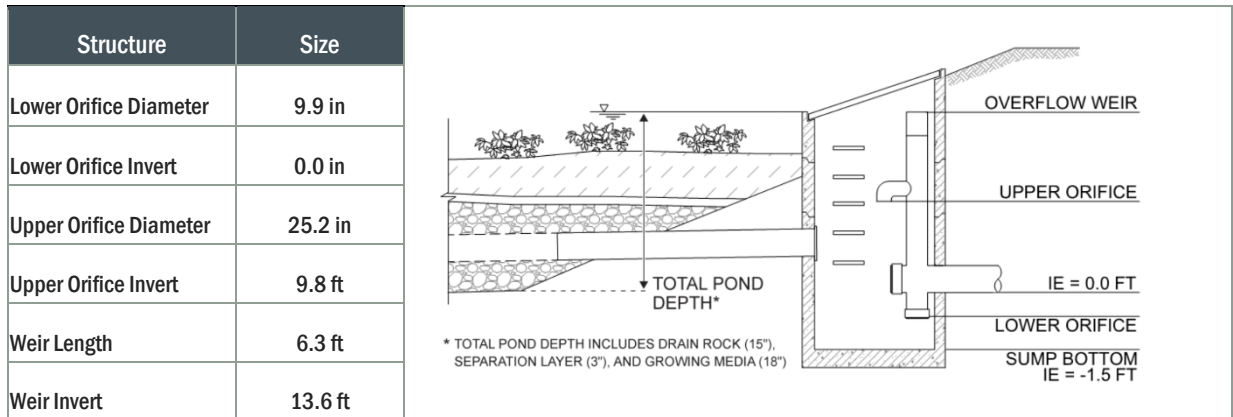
Scenario 1 outfall structure sizing and schematic for reduced contributing drainage area and 3H:1V sides slopes
